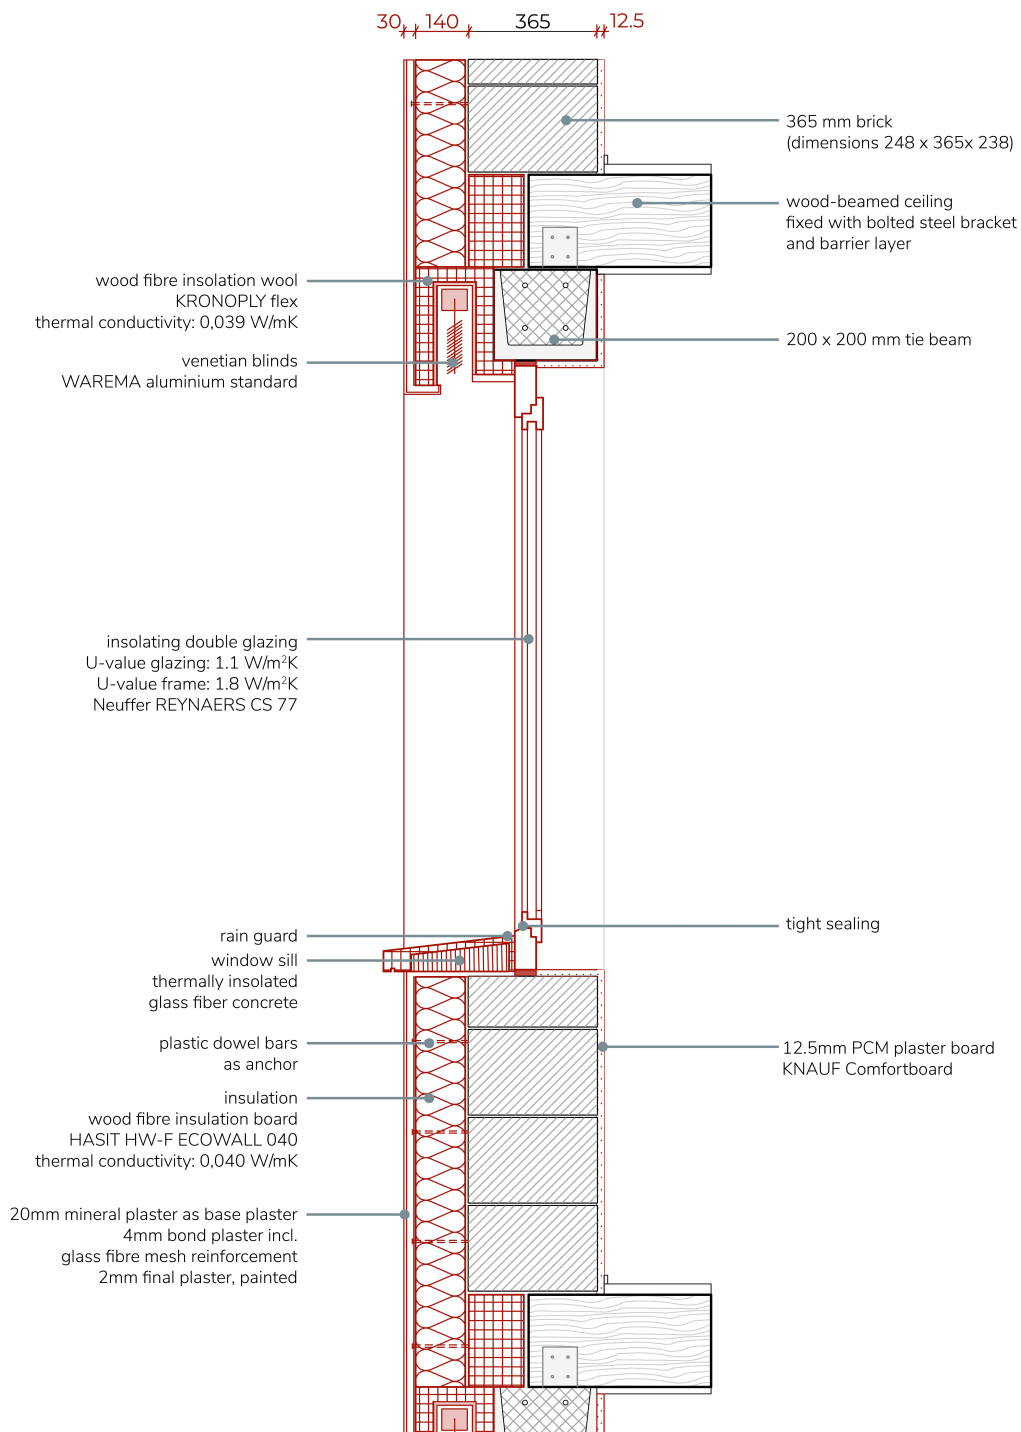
Section in 1:20 of case study façade retrofit proposal with retrofitted elements in red, source: own
